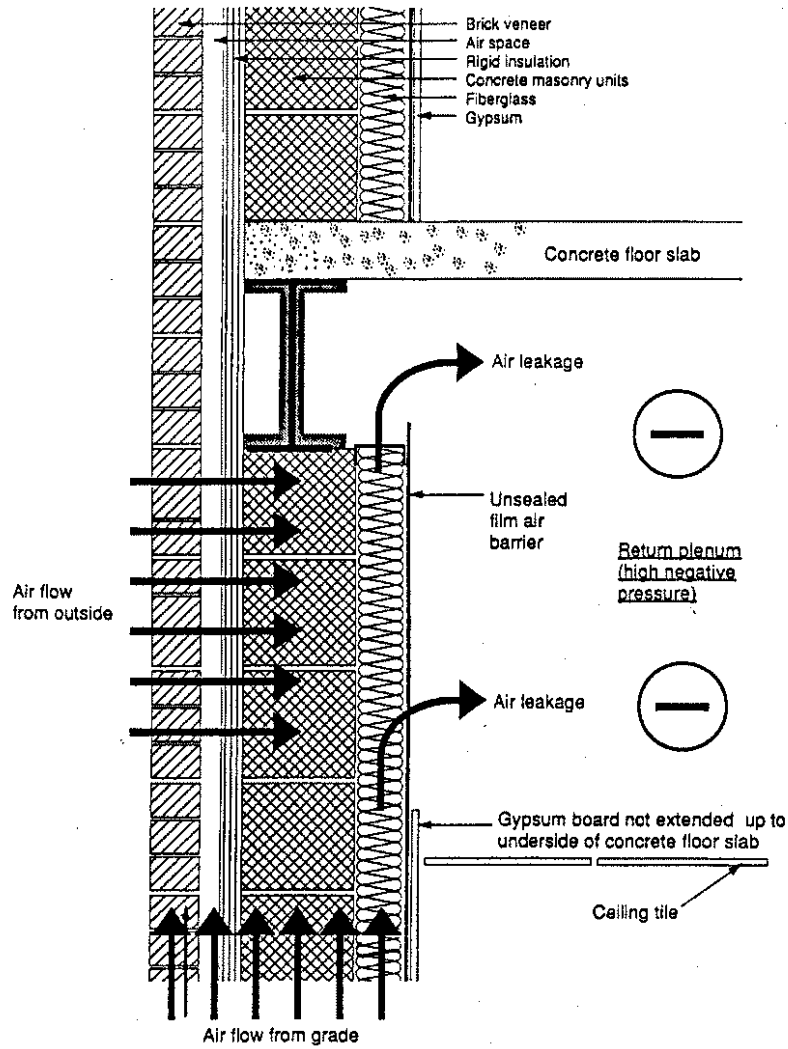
The exterior wall cavity was connected to foundation assembly. The error in design (unsealed internal gypsum board) permits drawing air from below grade to the return plenum.
